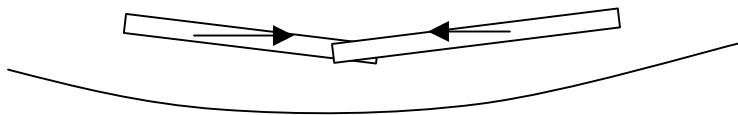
Potential fatigue problem in PAU connections
